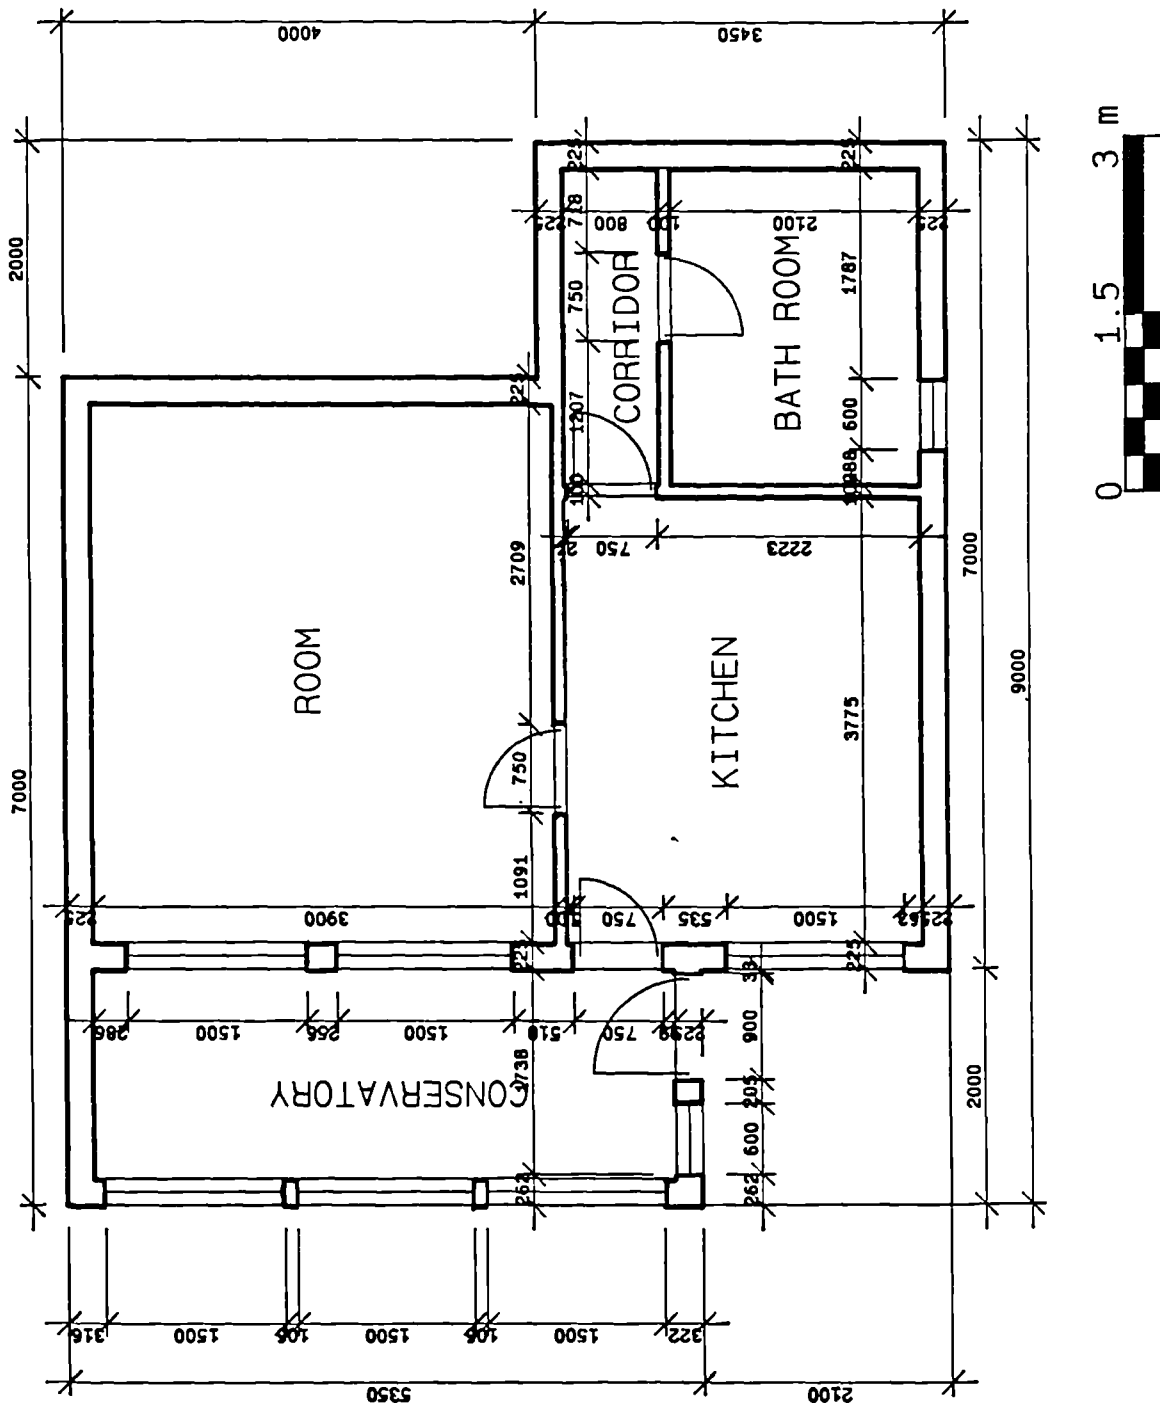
(a) - View in plan of building model with dimension line.
